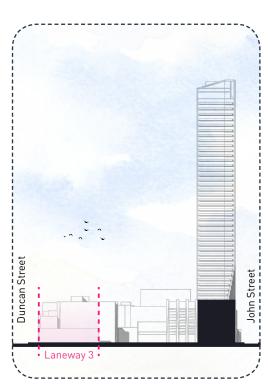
Enlarged Site Section A.B; 1:1,800 2014-, section
